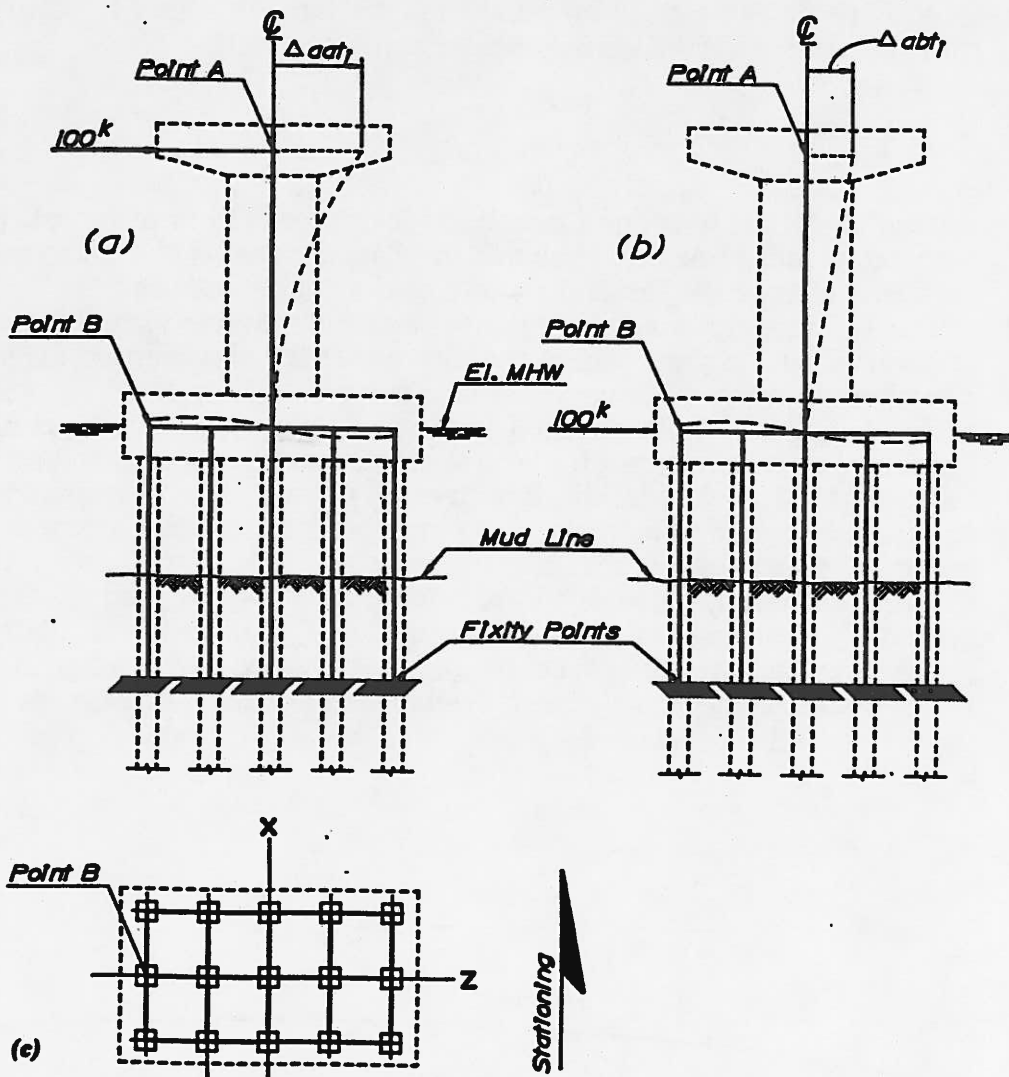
3-D Pier Model Shown in Front Elevation with Transverse Virtual Forces Applied: (a) At Point A; (b) At Point B
